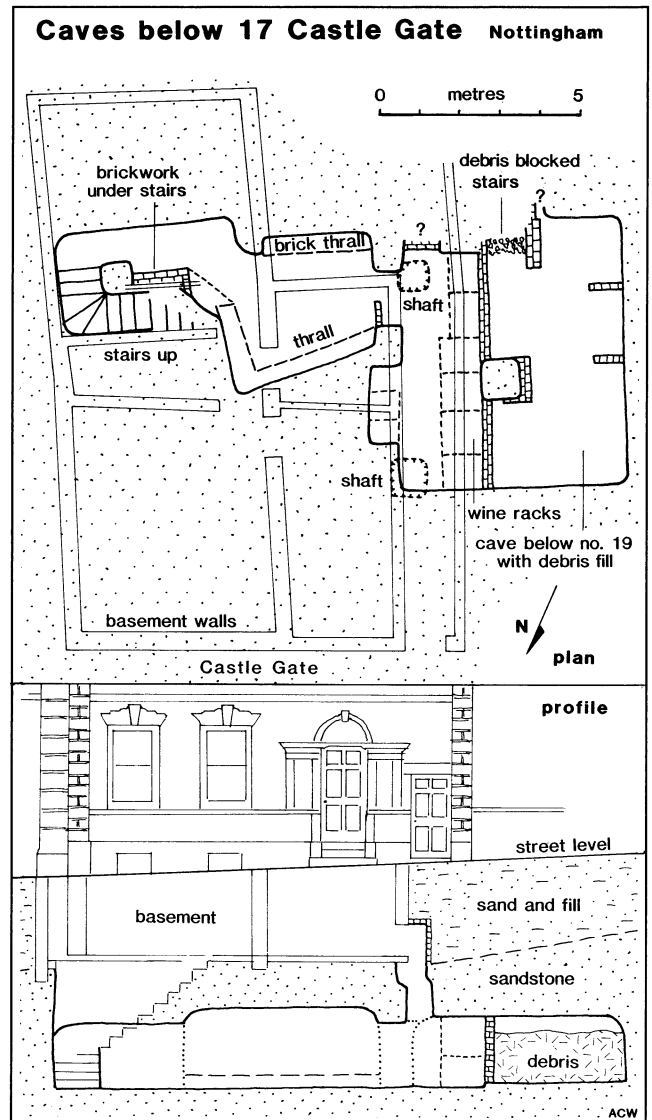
Plan and profile of the caves beneath 17 Castle Gate. (Cave survey by Tony Waltham and Ian Spibey).
